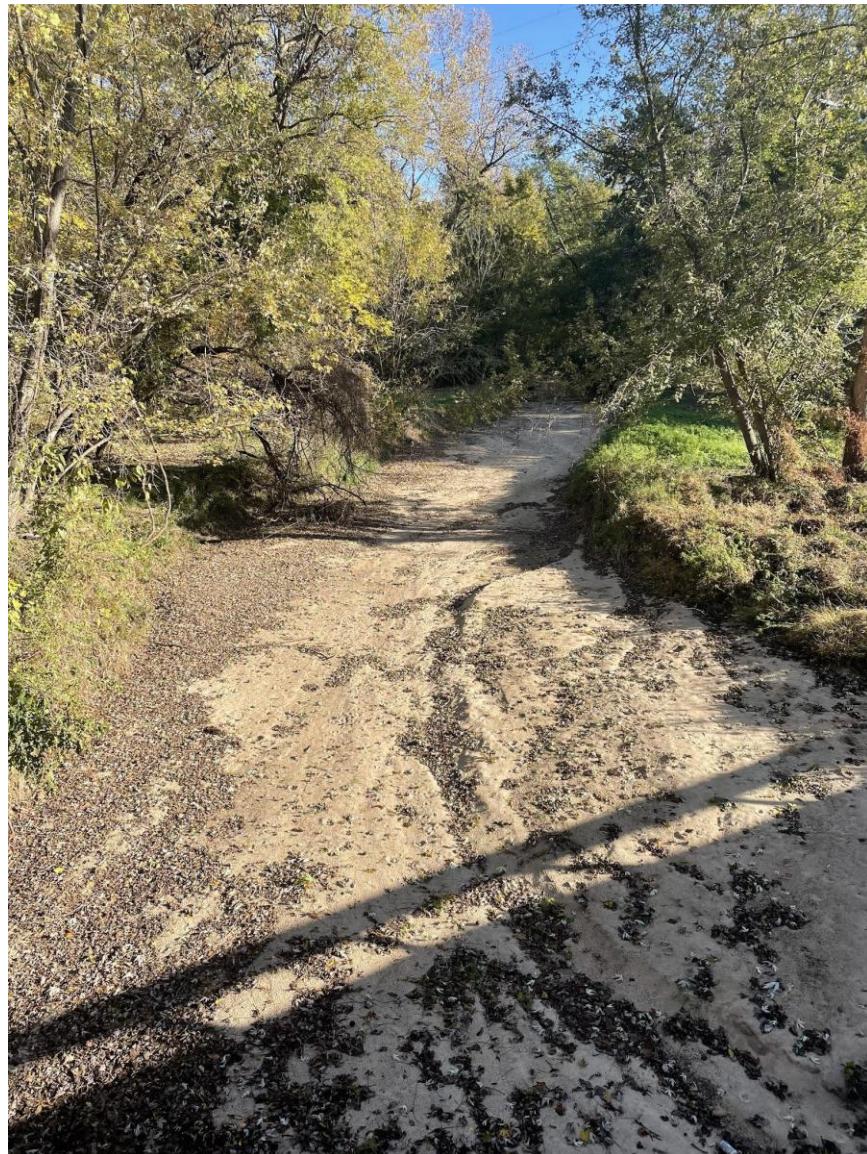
614-1 Bridge looking downstream, supplemental visit.
